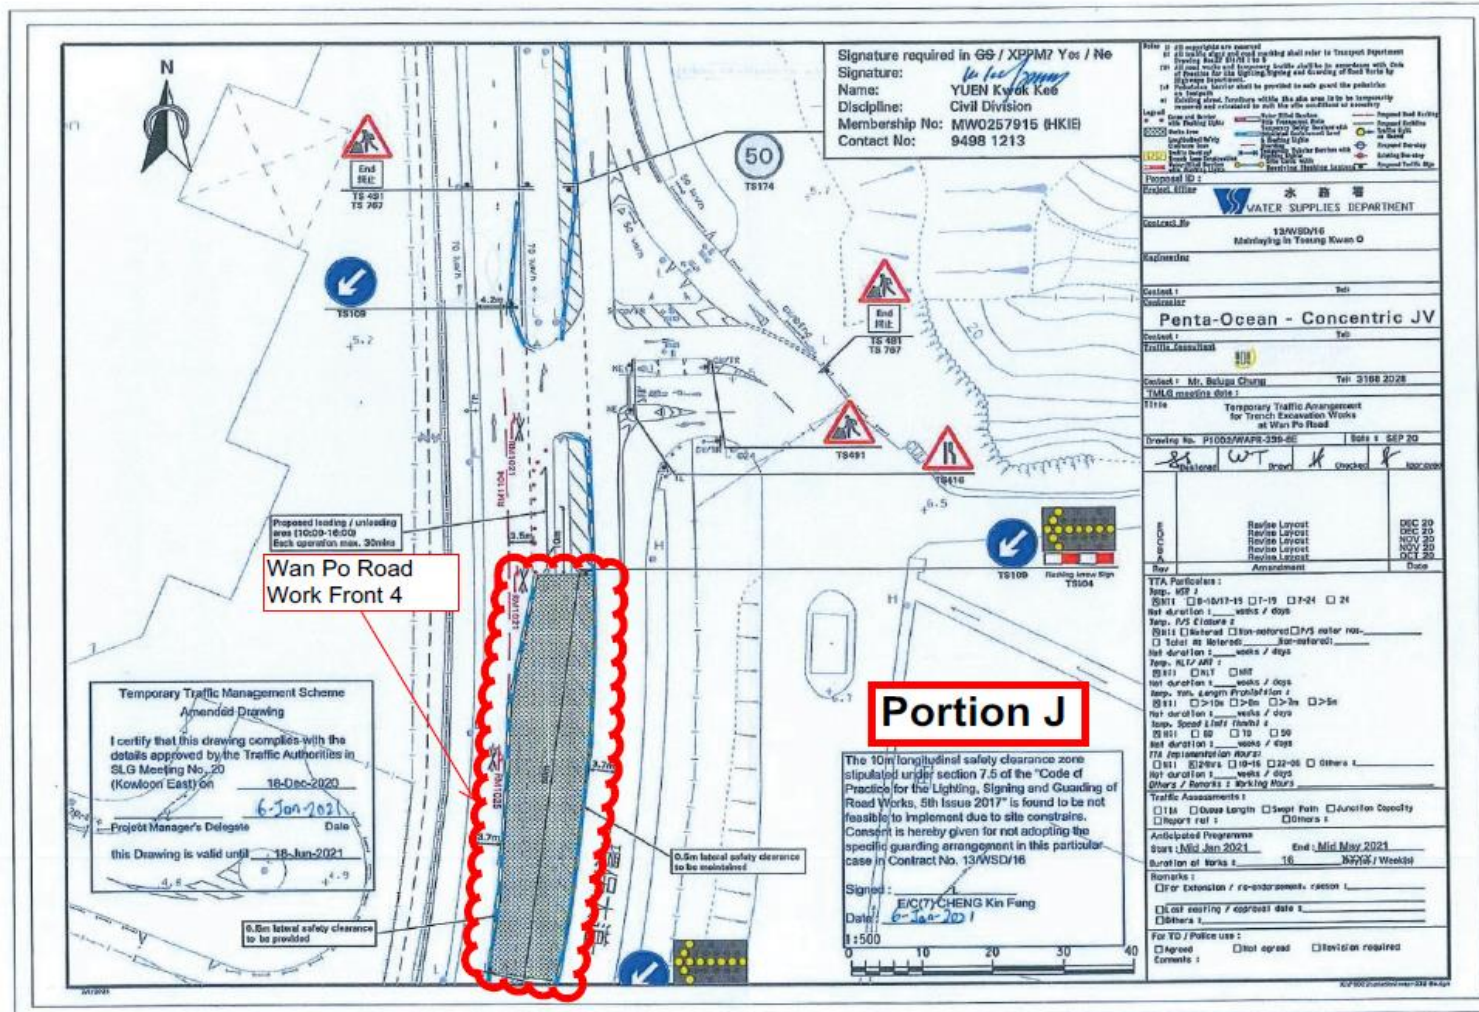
Location Plan for Portion J – Wan Po Road 4
